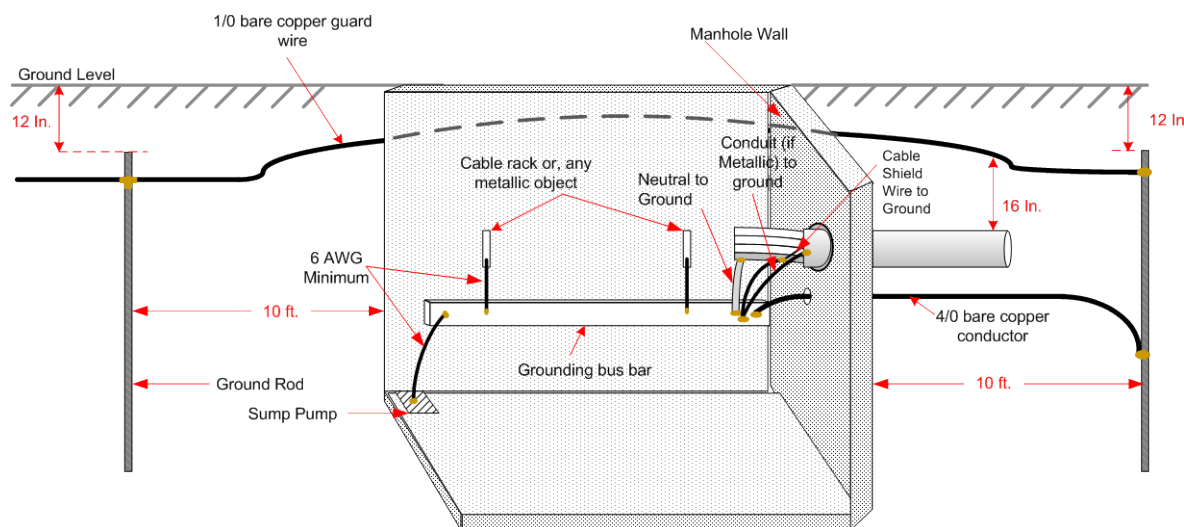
Grounding and guard wire installation detail at a manhole.
